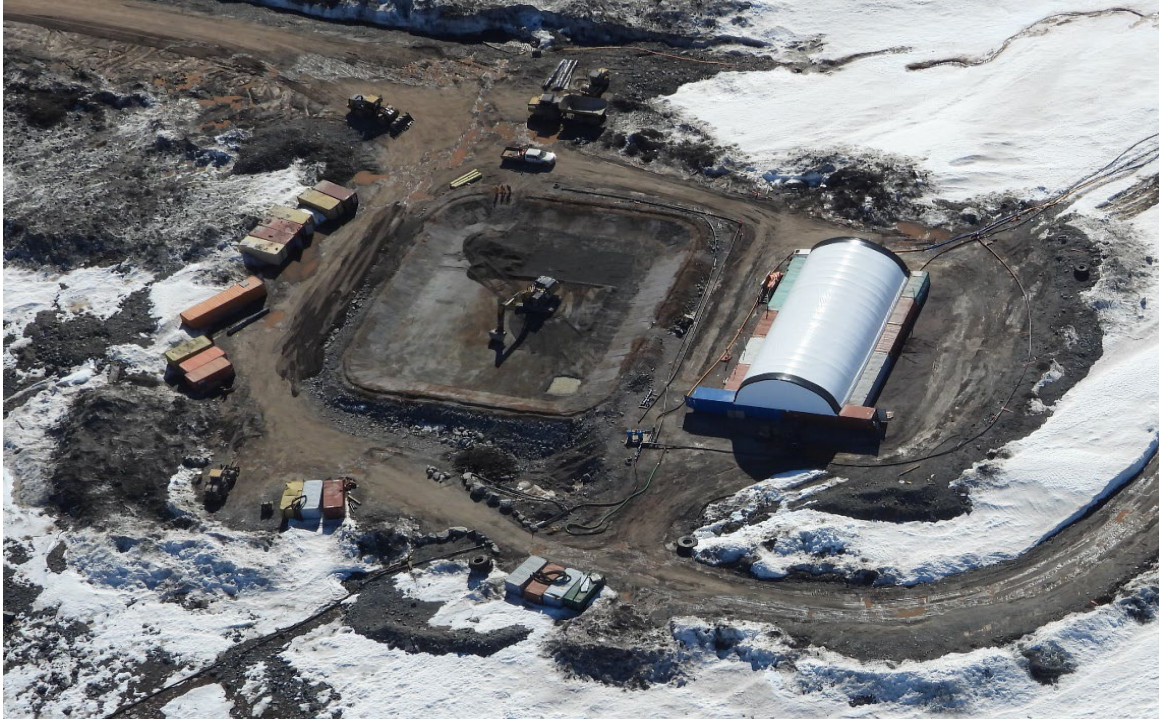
Geotube Replacement at the Waste Rock Facility Water Treatment Plant - June
